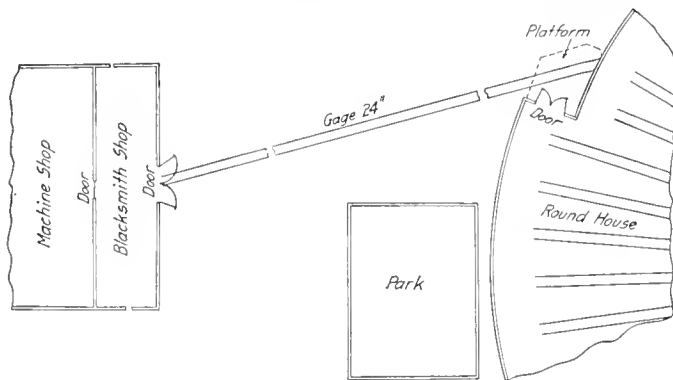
Delivery Track Between Engine House and Machine Shop.
